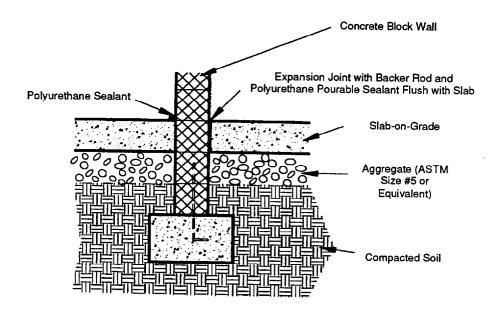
Interior footing/foundation wall. Not to scale.
